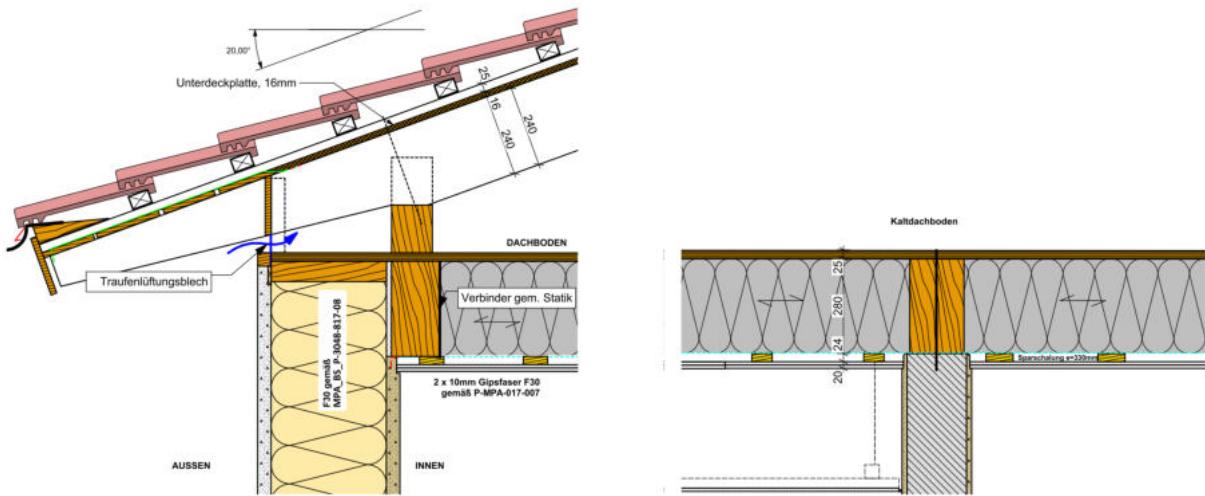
Joint of exterior wall to attic (left) and joint of interior wall/corridor partition to cold attic (right)
